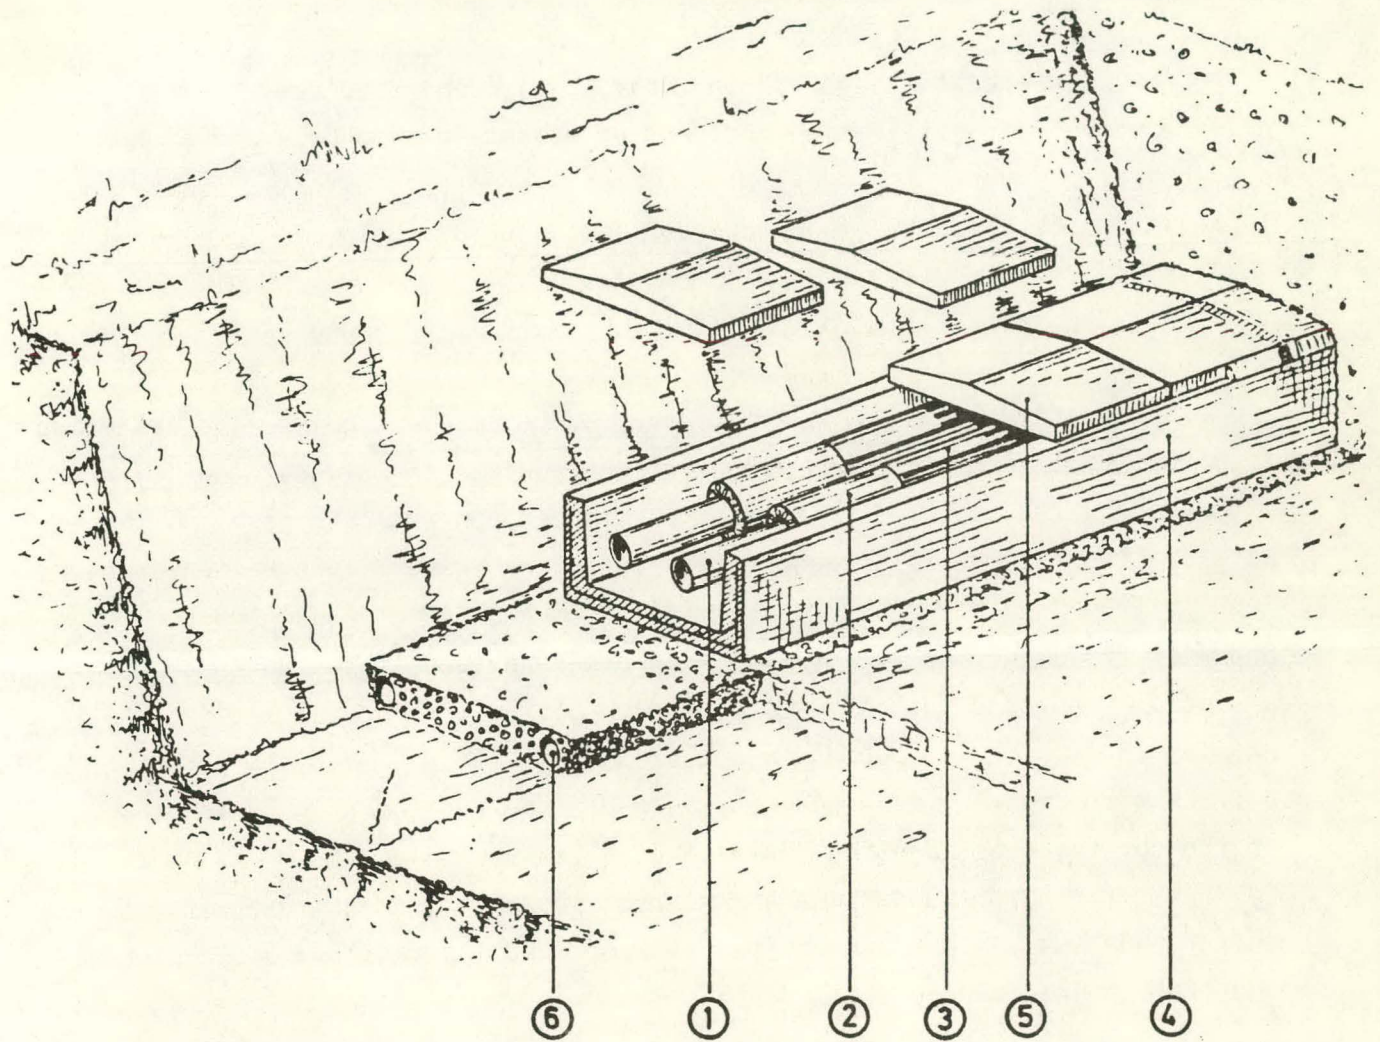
CONCRETE CULVERT CAST-IN-SITU
